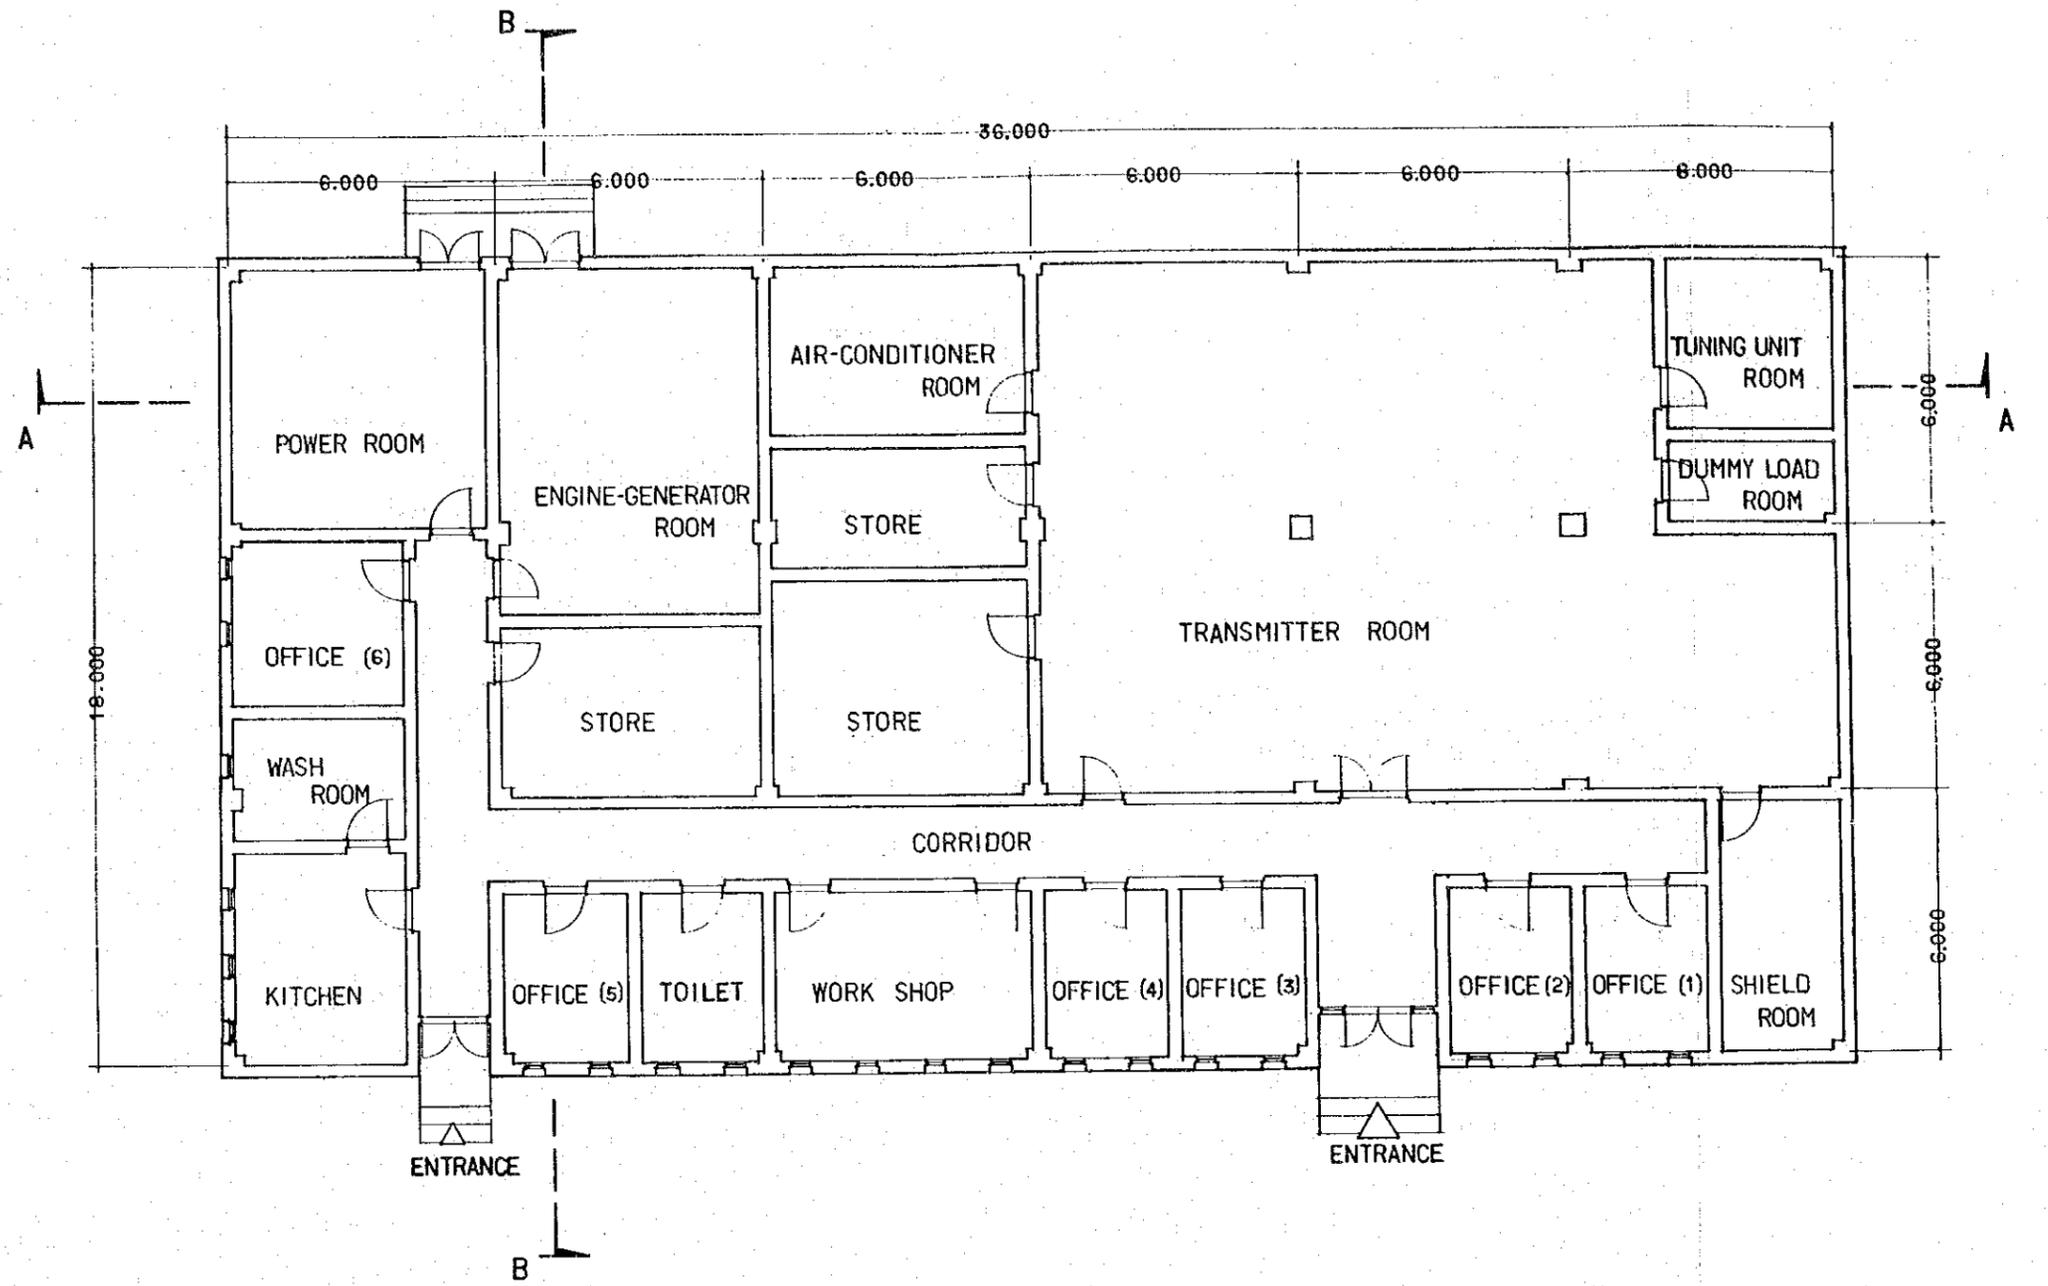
FLOOR PLAN — KATHMANDU TRANSMITTING STATION
